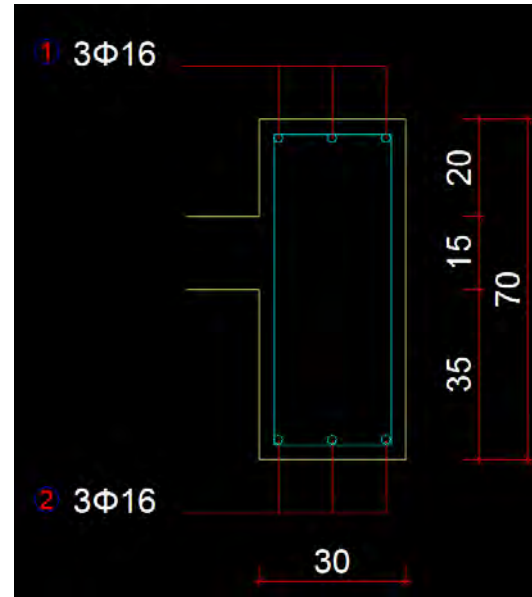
Beam Reinf. Plan of 3 St. Build
